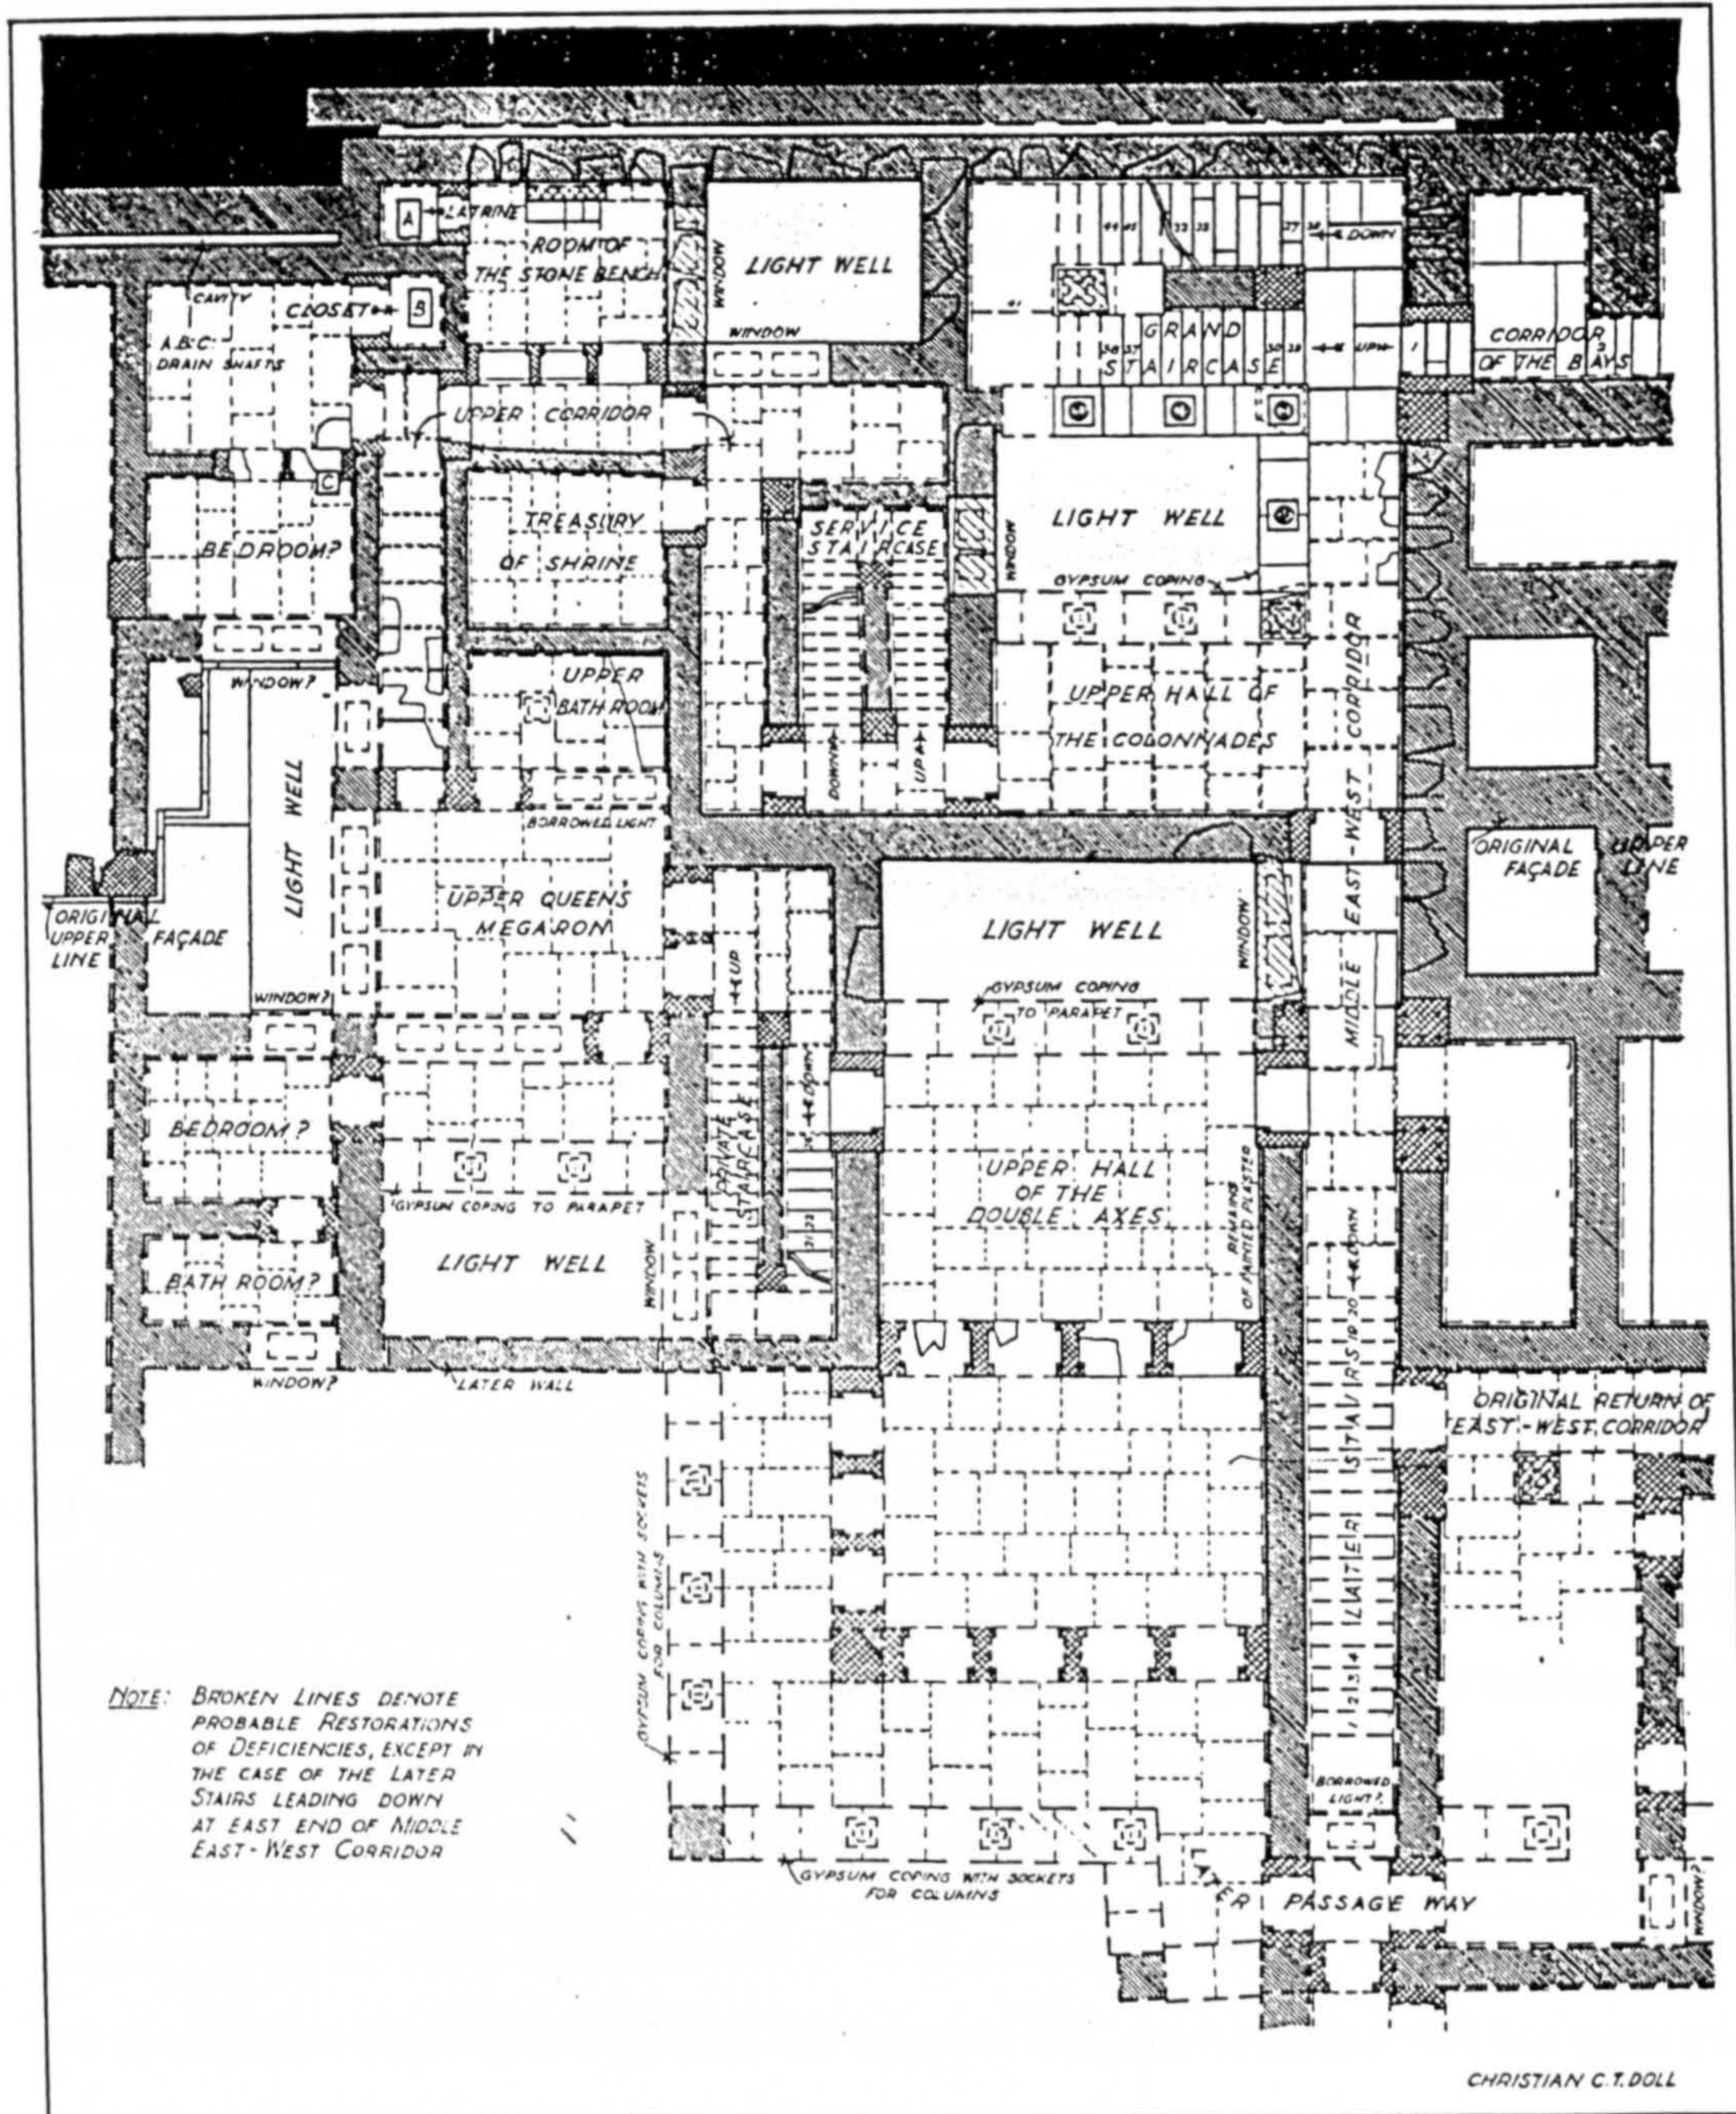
First floor plan of the Domestic Quarter. Christian Doll.
